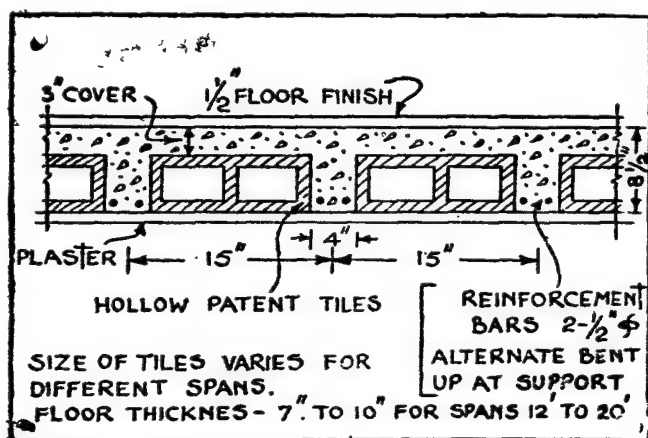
Flat floors of hollow clay tiles of rectangular variety.
